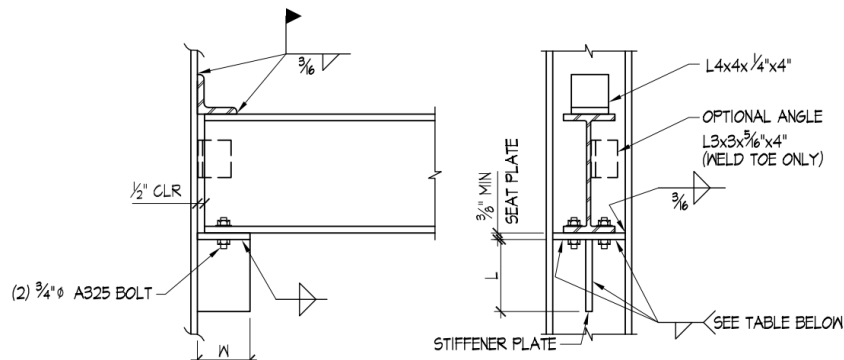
Typical Stiffened Seat Beam Connections Detail, 2/S2.01
